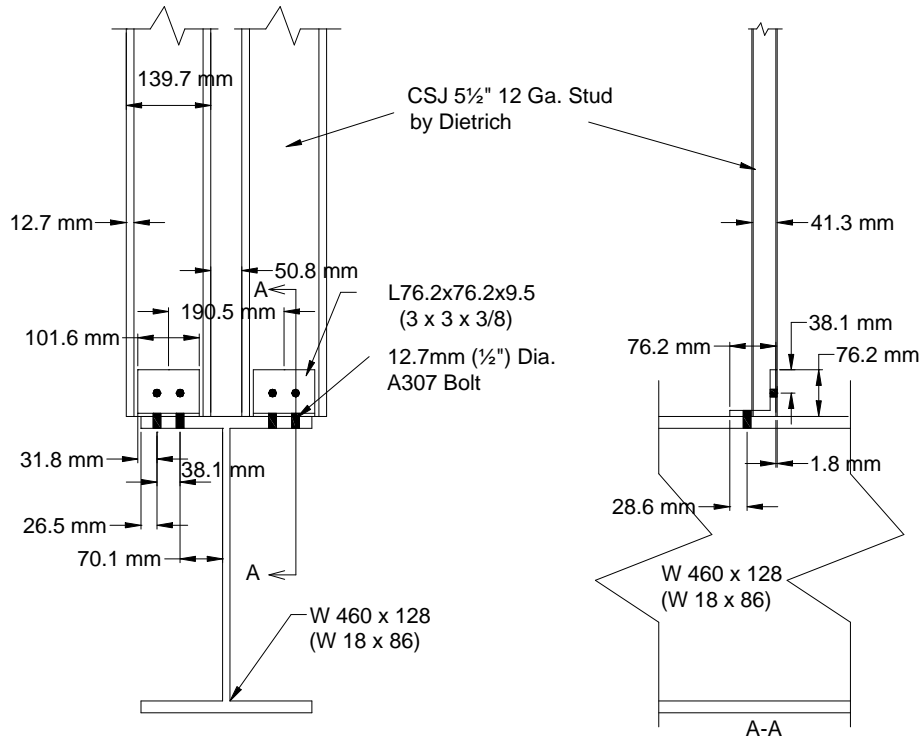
Cold-Formed Steel Stud-to-Beam Connection Details for Specimens F3
